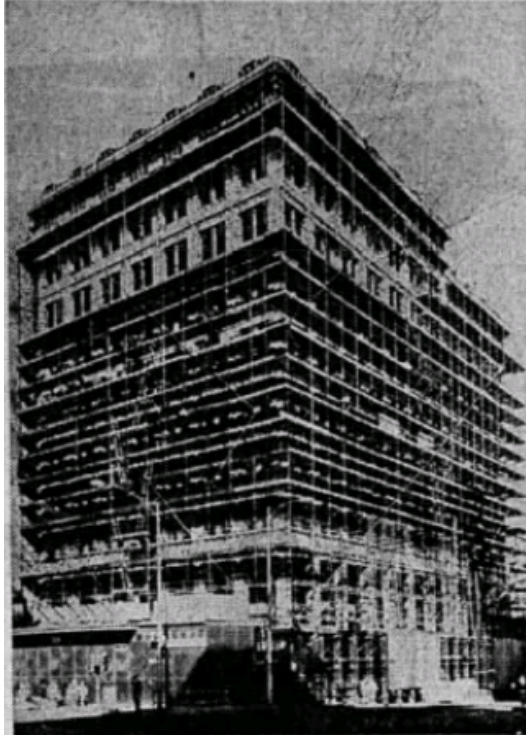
New Legal & General House under construction, 1966. (Source: *Age* 25 October 1966:13)
